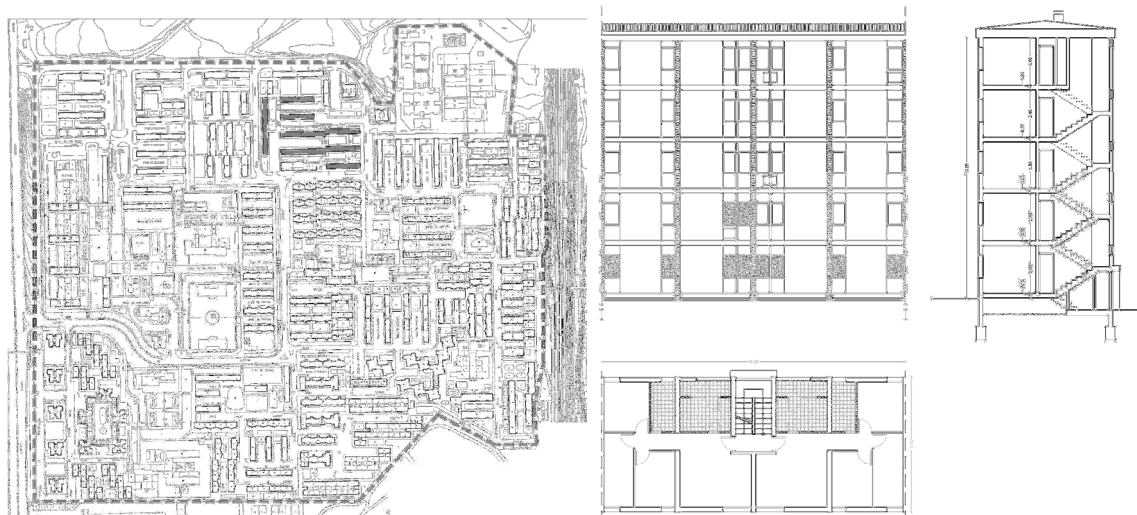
Left: Neighbour floor plan with the analysed block in black. Right: Floor, main facade and section of the studied building block.
